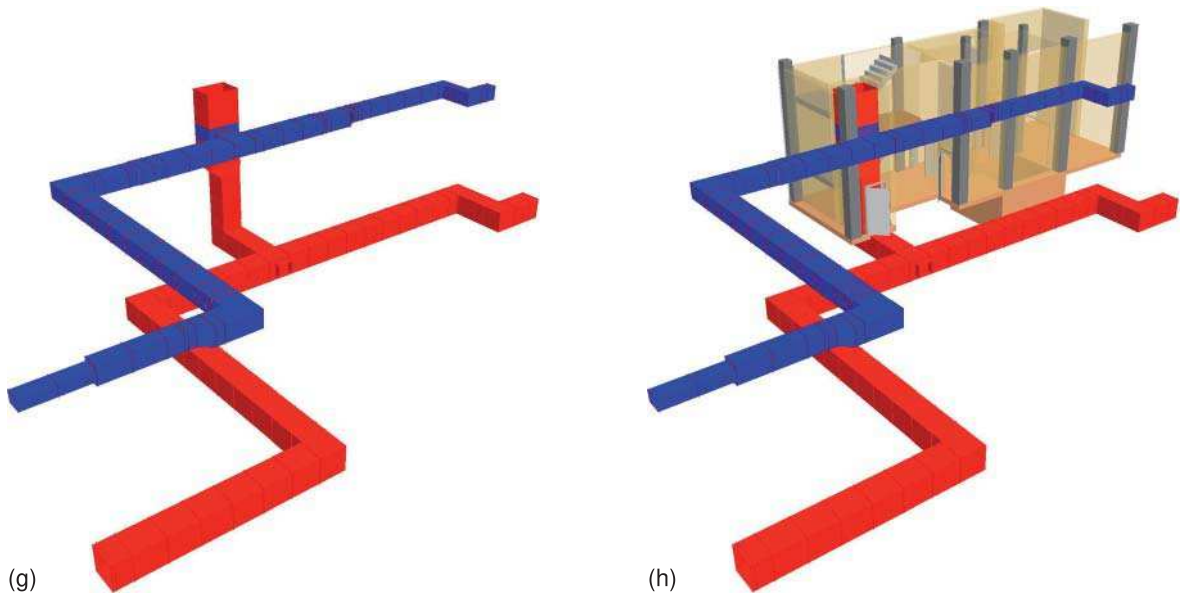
(g) Ground floor duct-work and (h) ground floor risers + architectural fabric
